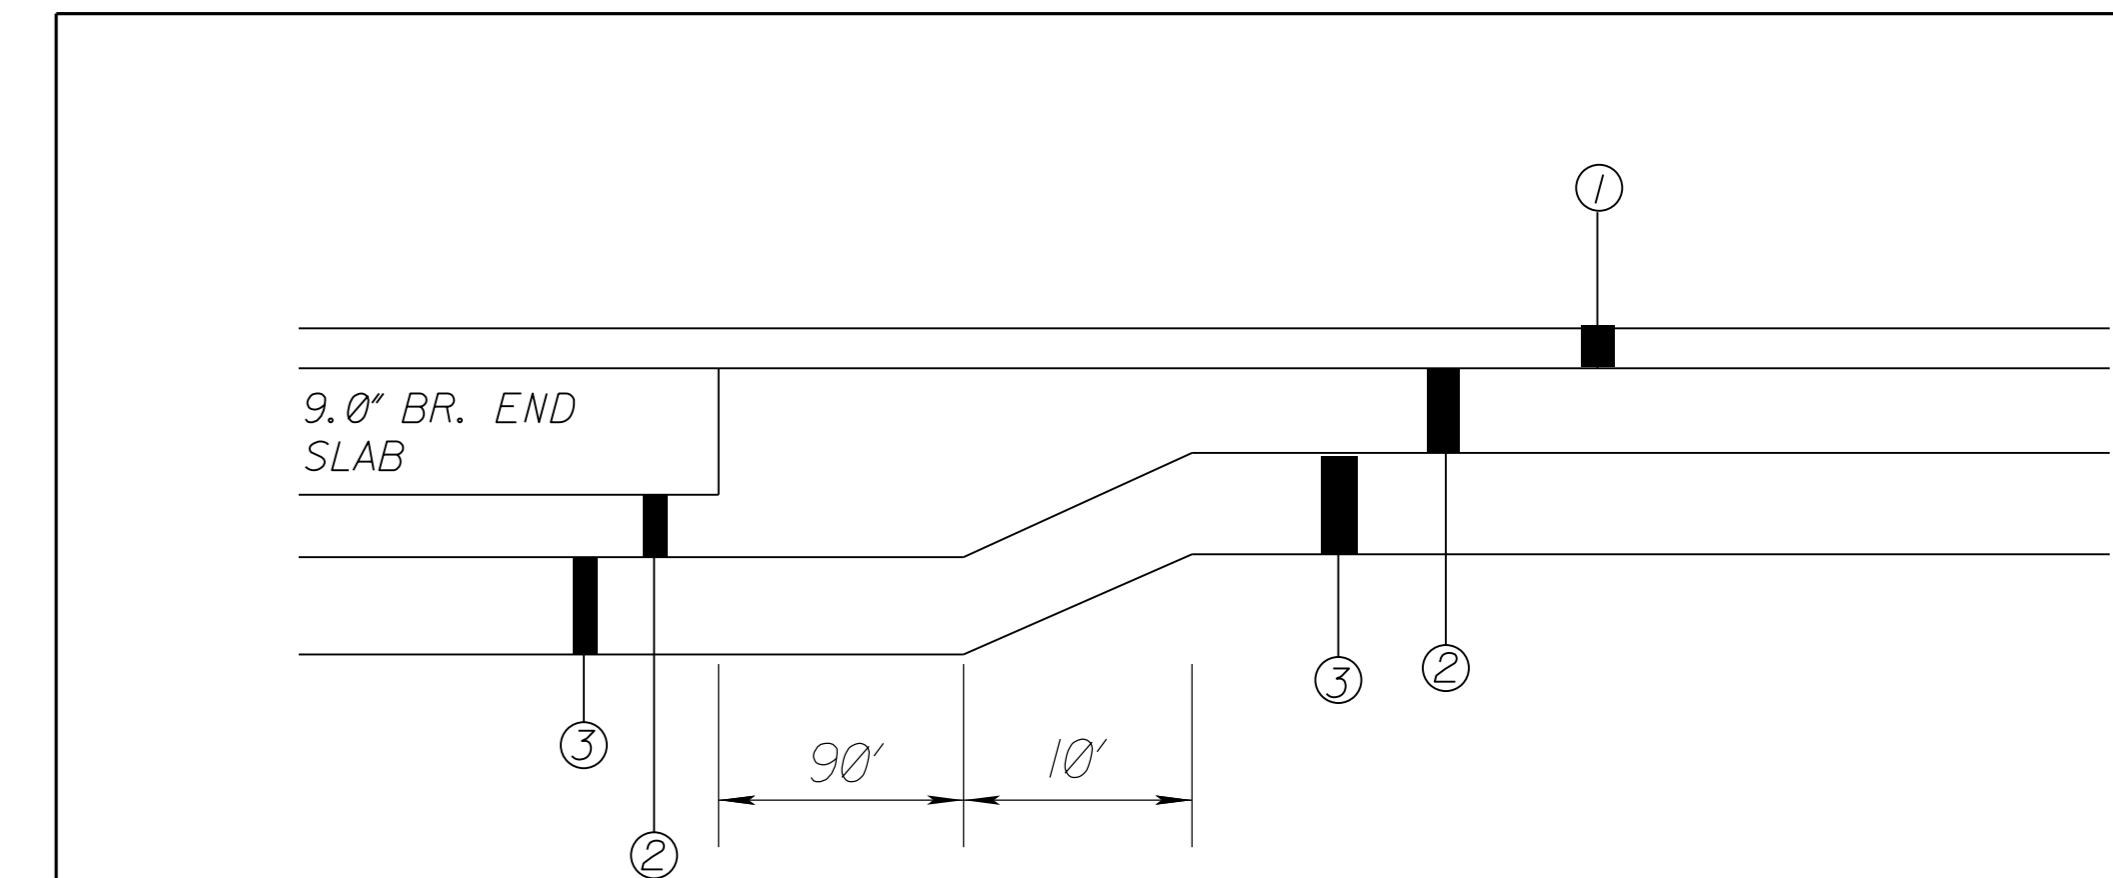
DETAIL OF PAVED SHOULDERS AT BRIDGE ENDS
